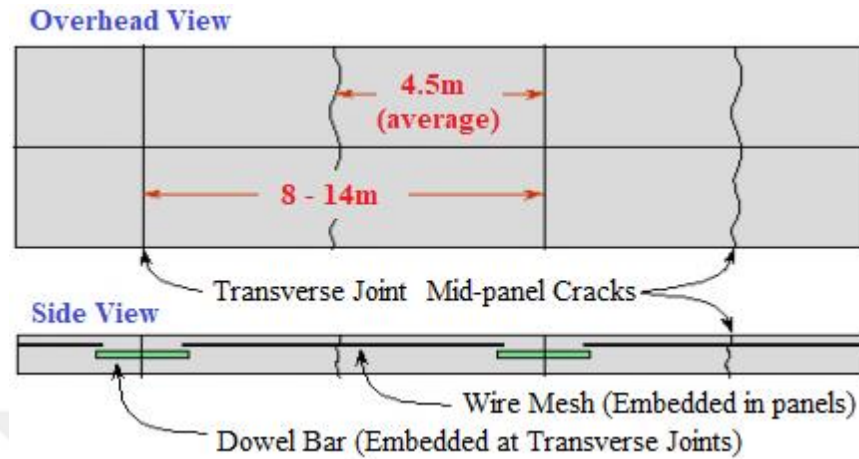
Jointed reinforced concrete pavement (Walubita et al., 2017)
